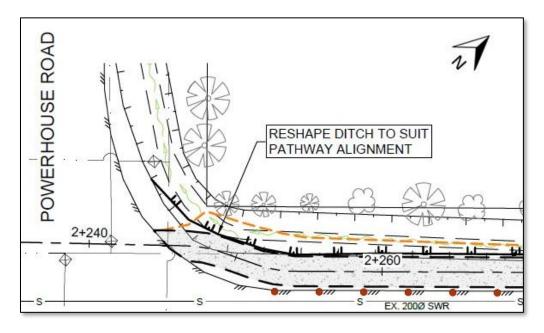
Proposed scope activities at Powerhouse Road including culvert installation and extension on the south side of the road, vegetation removal, and re-shaping the ditchline on the west side of Lake Trail Road.
